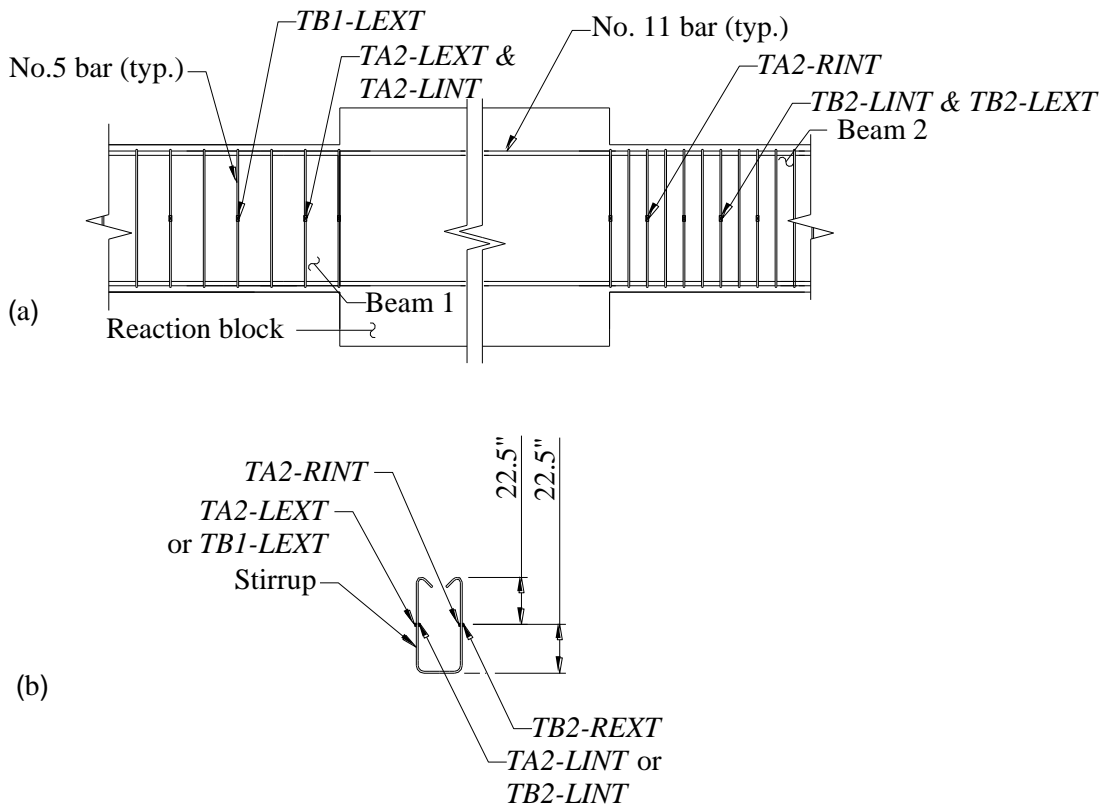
Layout of transverse reinforcement strain gauges: (a) location of hoops with instrumented stirrups; (b) gauge locations on a stirrup.
